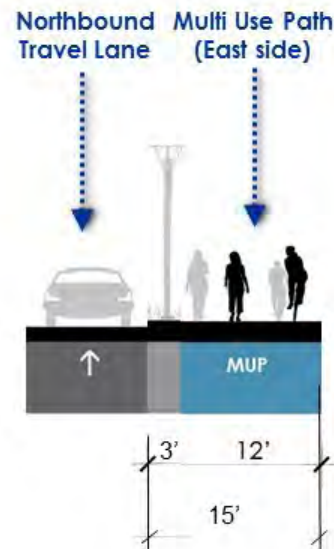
Typical Section Hartford Dr. Segment 2 (21st St NE to Centennial Trail)
